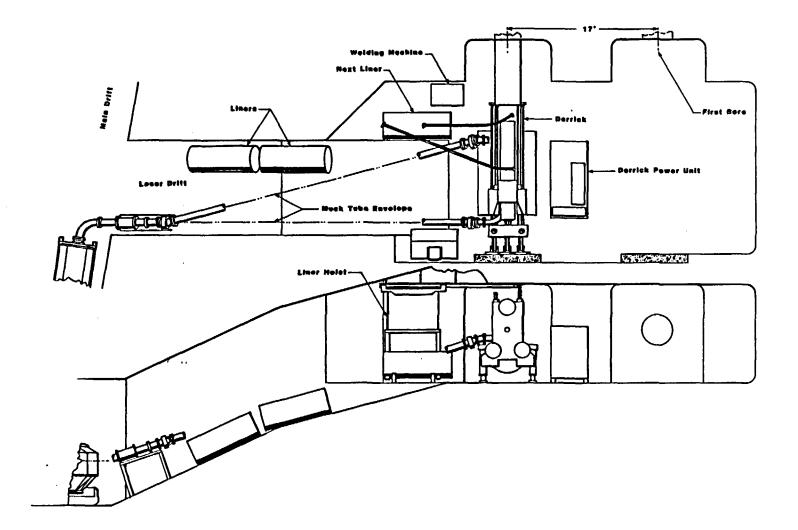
NTS Test Site Arrangement, Bore No. 1
